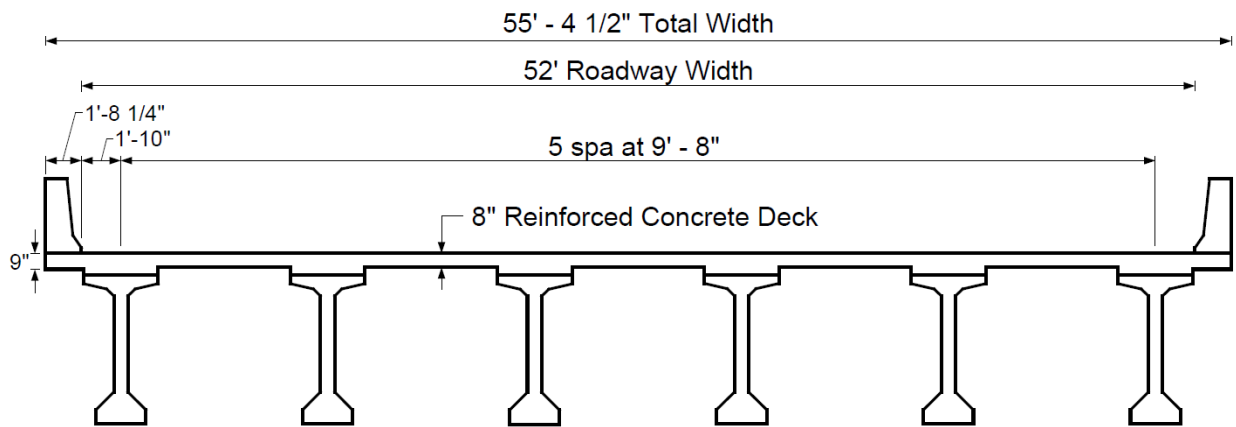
Transverse Section of Example Bridge (FHWA 2015, 2-4)
